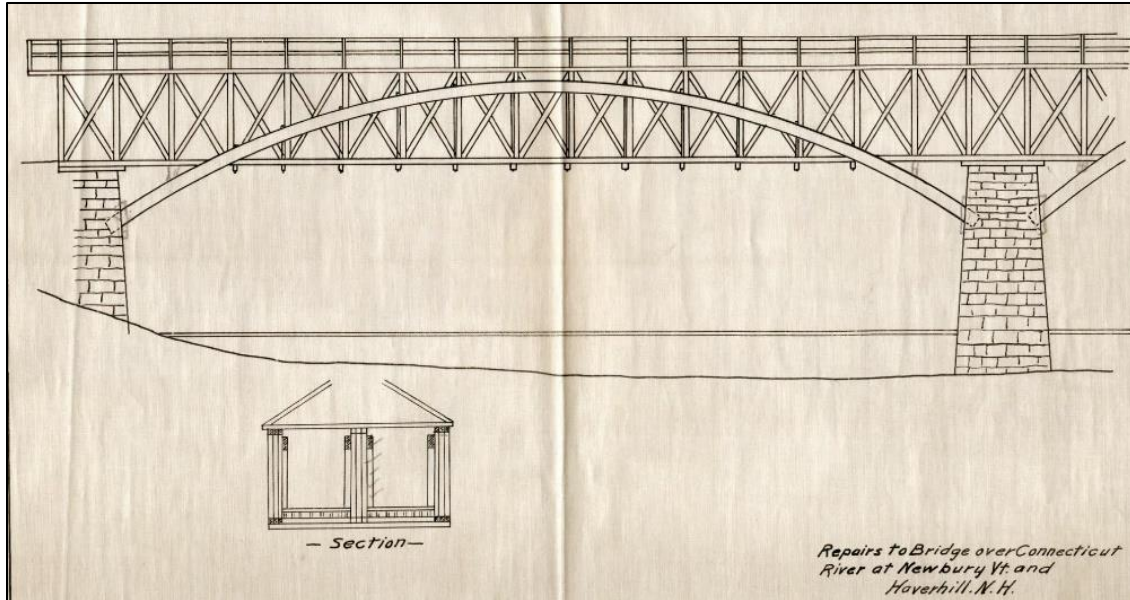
Drawing by John Storrs, 1906, of Newbury Road Covered Bridge over Connecticut River between Haverhill NH and Newbury VT, built 1834, showing reinforcing arches added that year. Section drawing shows rare two-lane design with a third truss down the center. Possibly the first Long Truss – as patented by Stephen Long in 1830 – built in New Hampshire. A 1913 flood damaged the bridge and it was replaced with a steel Pratt truss built by United Construction Company, with John W. Storrs acting as consulting engineer; see Portfolio Figure 30 (Source: Storrs File No. 6).
